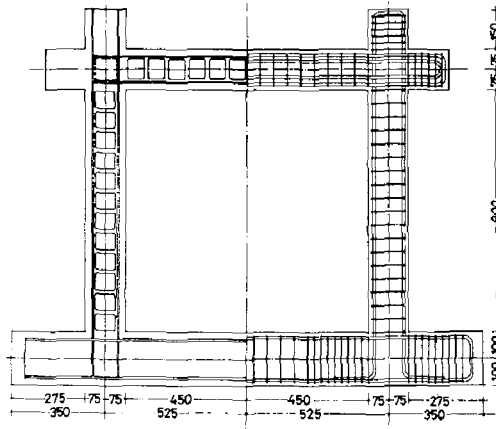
Dimensions of Open-web Steel Component(unit: mm)
